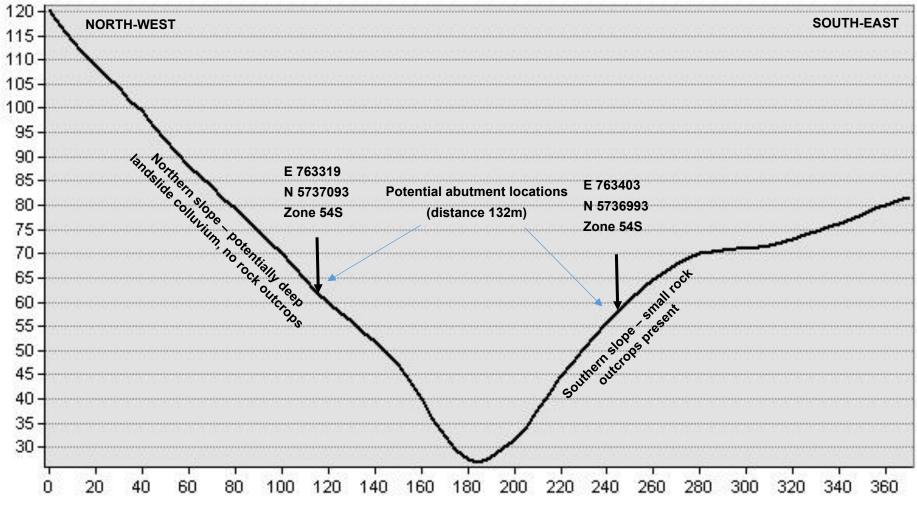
Terrain cross section at potential Bridge 0 abutment locations, looking east (axes in m)
